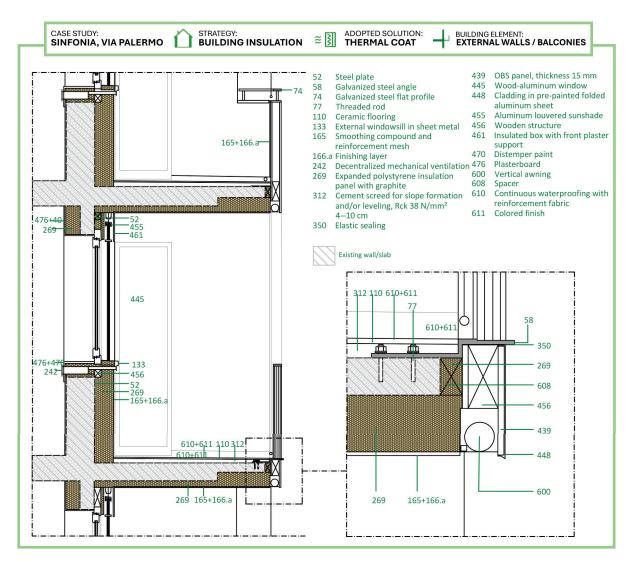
Exemplification of the portfolio of technical solutions for thermal insulation of Building 2 on Via Palermo in Bolzano. Image edited by the authors from original drawings by © Laboratorio di Architettura.
